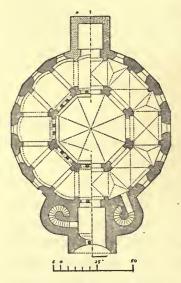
Aachen or Aix-la-Chapelle, Prussia: Chapel, original plan as built in the ninth century.
